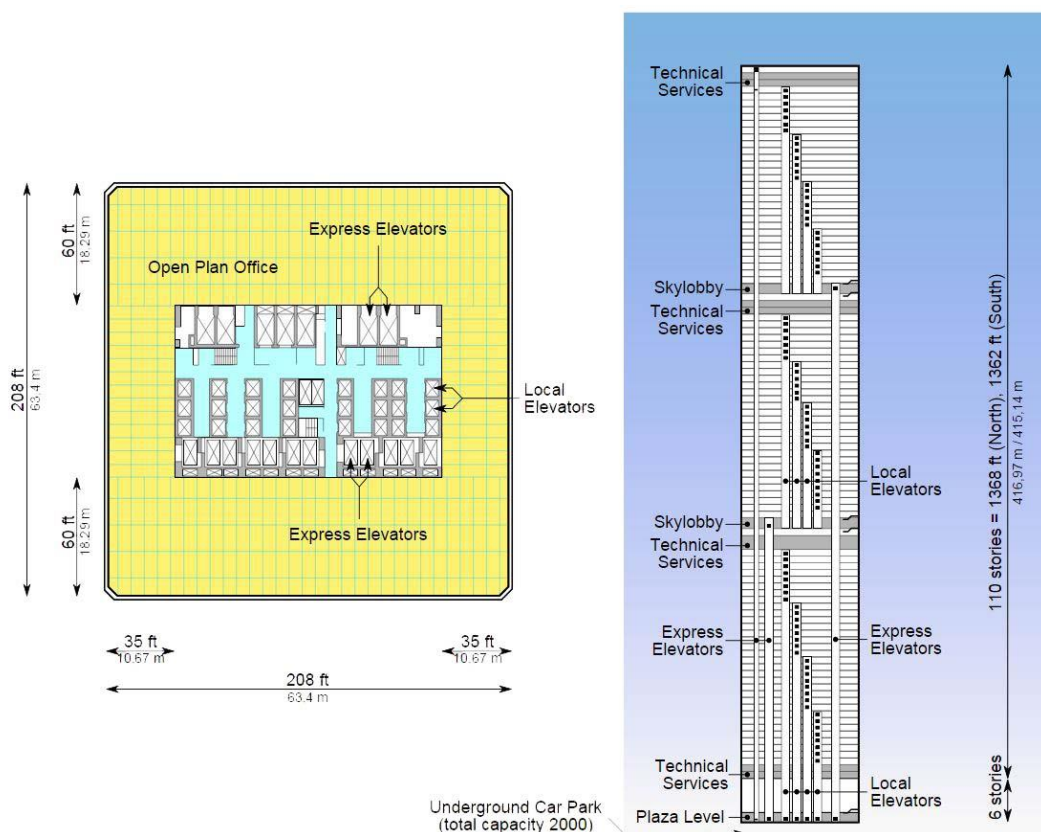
Plan layout and section of World Trade Centre (http://en.wikipedia.org/wiki/Constructionof_the_World_Trade_Center).
